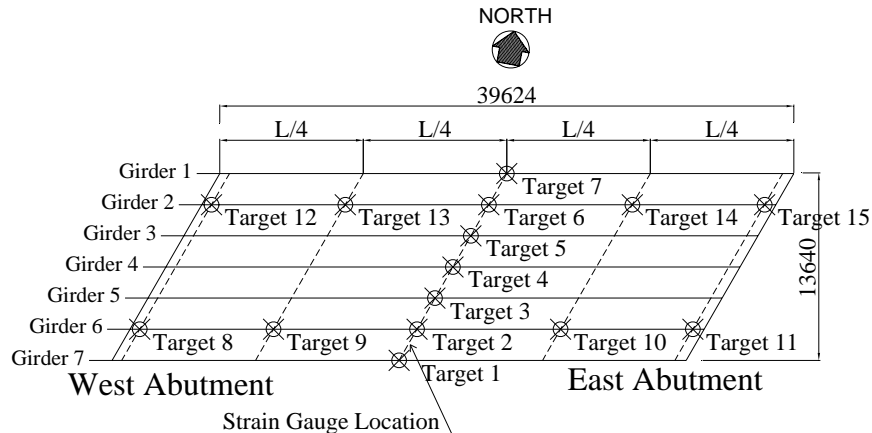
Target Positions: Plan View of Bridge B-20-148 (Drawing not to scale)
